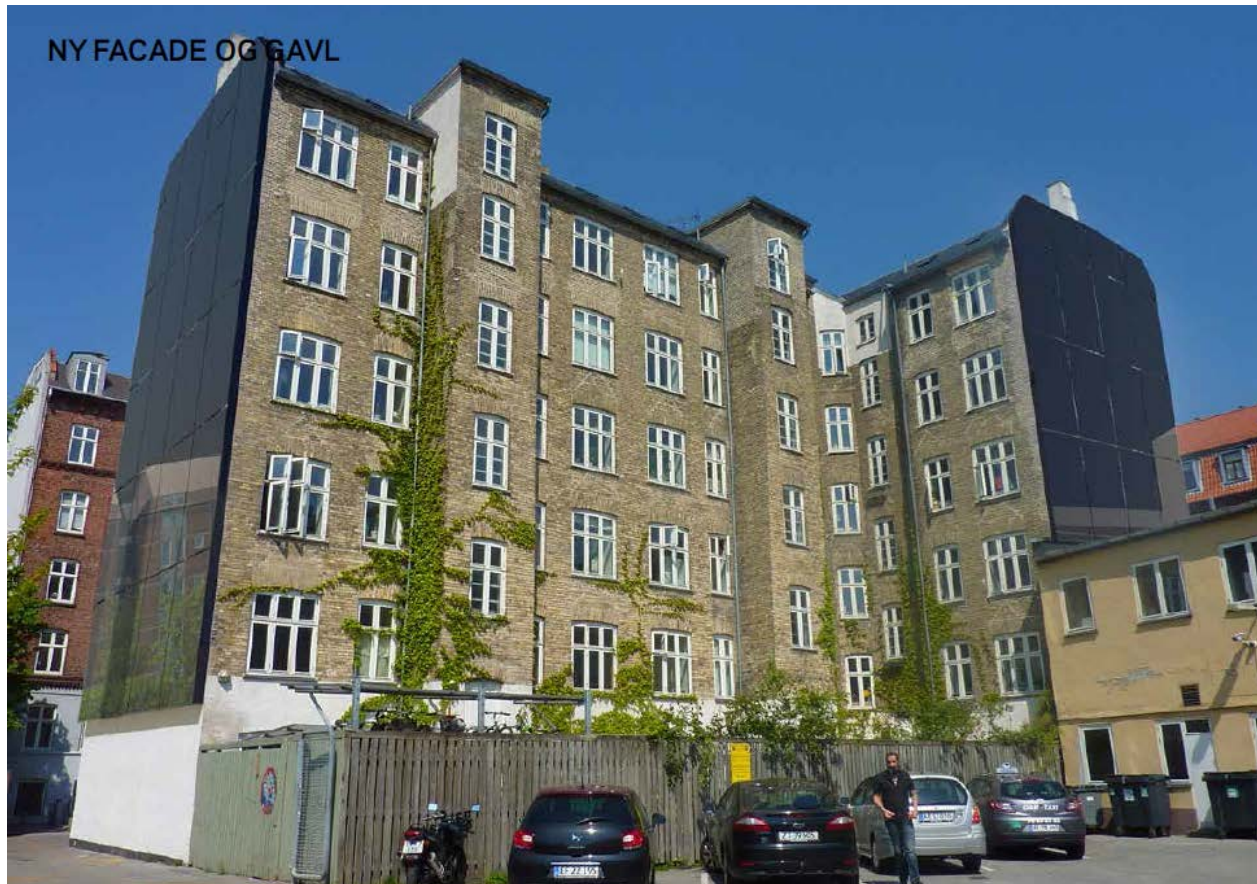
An Architects view of the demonstration installation, on two walls in Nørrebro Copenhagen.
